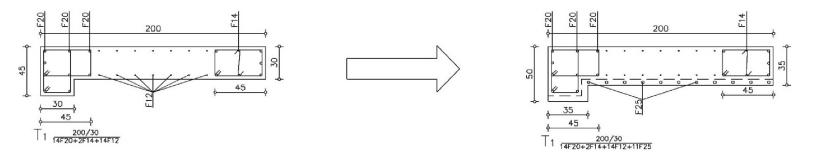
T1 Column Cross Section Area-Before and After the Strengthening
